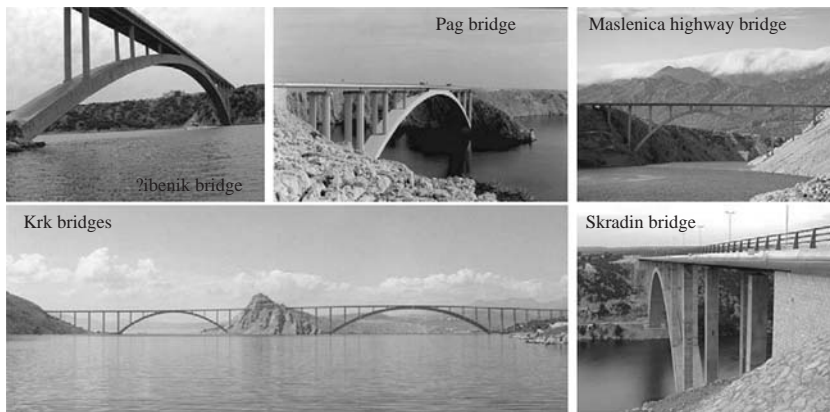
Six large reinforced concrete Adriatic arch bridges.
